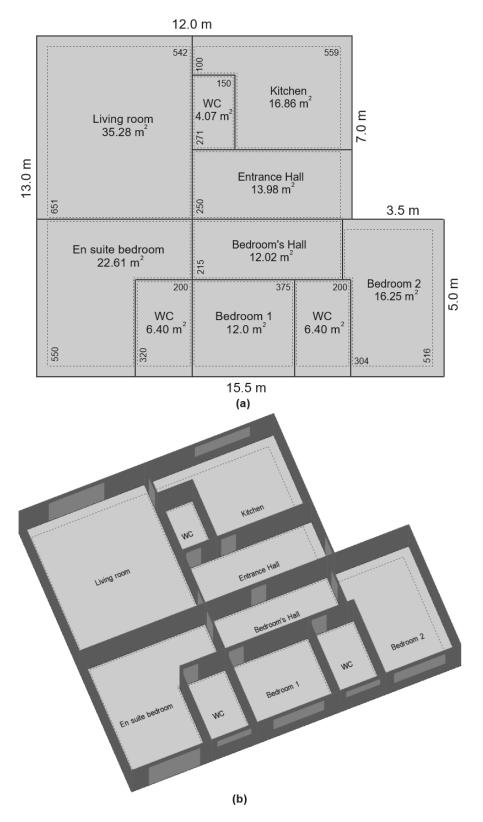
(a) Floor plan and (b) axonometric projection of the considered standard dwelling.
